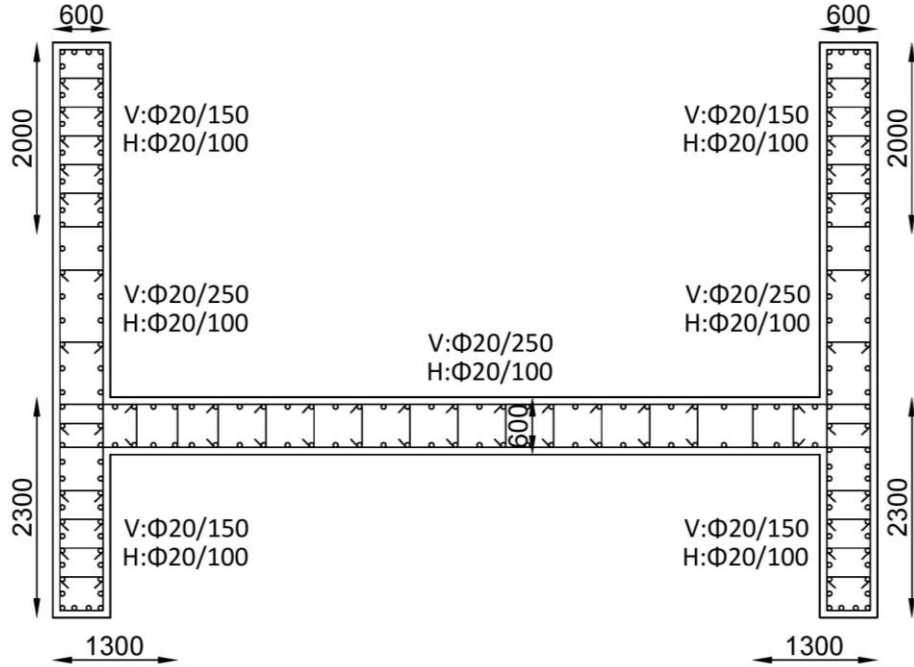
Shear Wall Longitudinal Reinforcement for Stories Between 21 - 30
